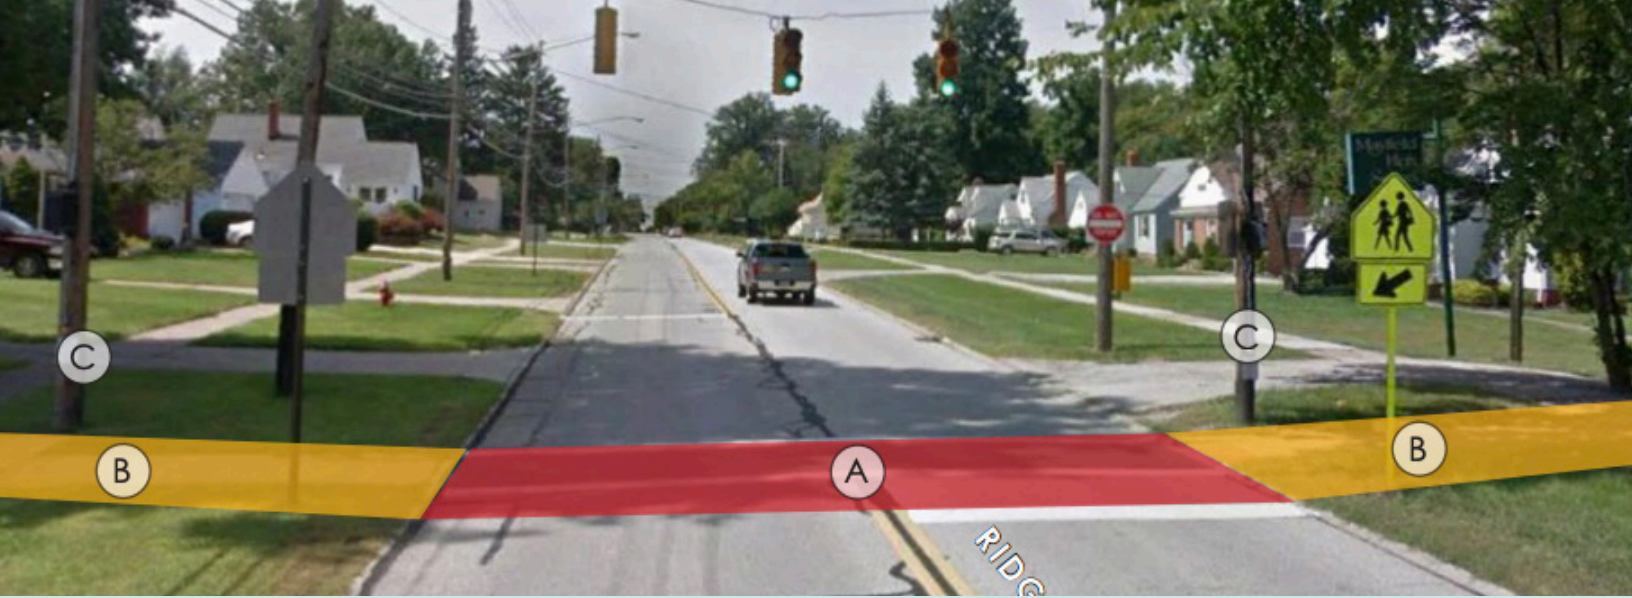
Proposed crosswalk improvements on Ridgebury Boulevard (AECOM, 2019b).
